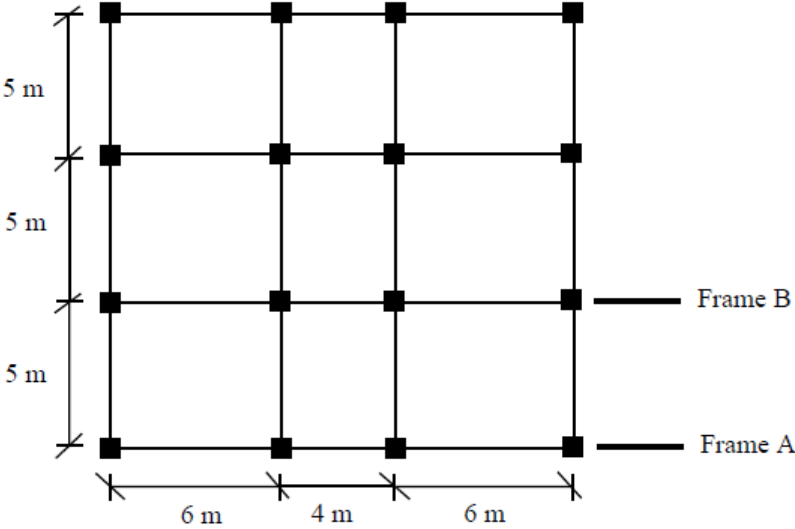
Story plan of the twelve story building with relaxed capacity design
